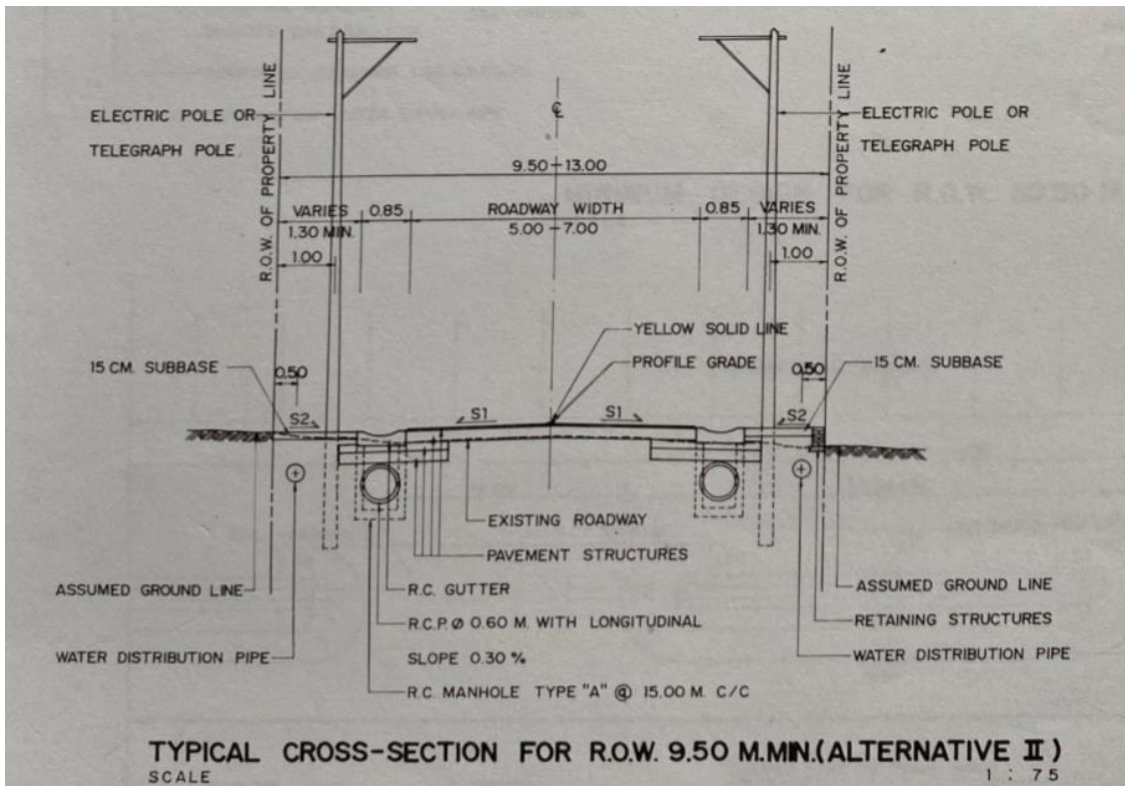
9: Alternative Cross Section Type 11-(Original source-Standard Drawings Ministry of highways Thailand
